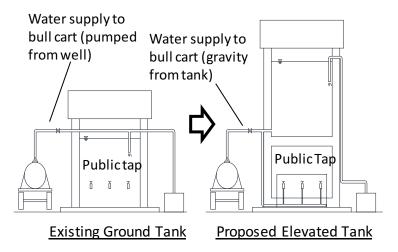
Proposal of the Elevated Water Supply Tank
